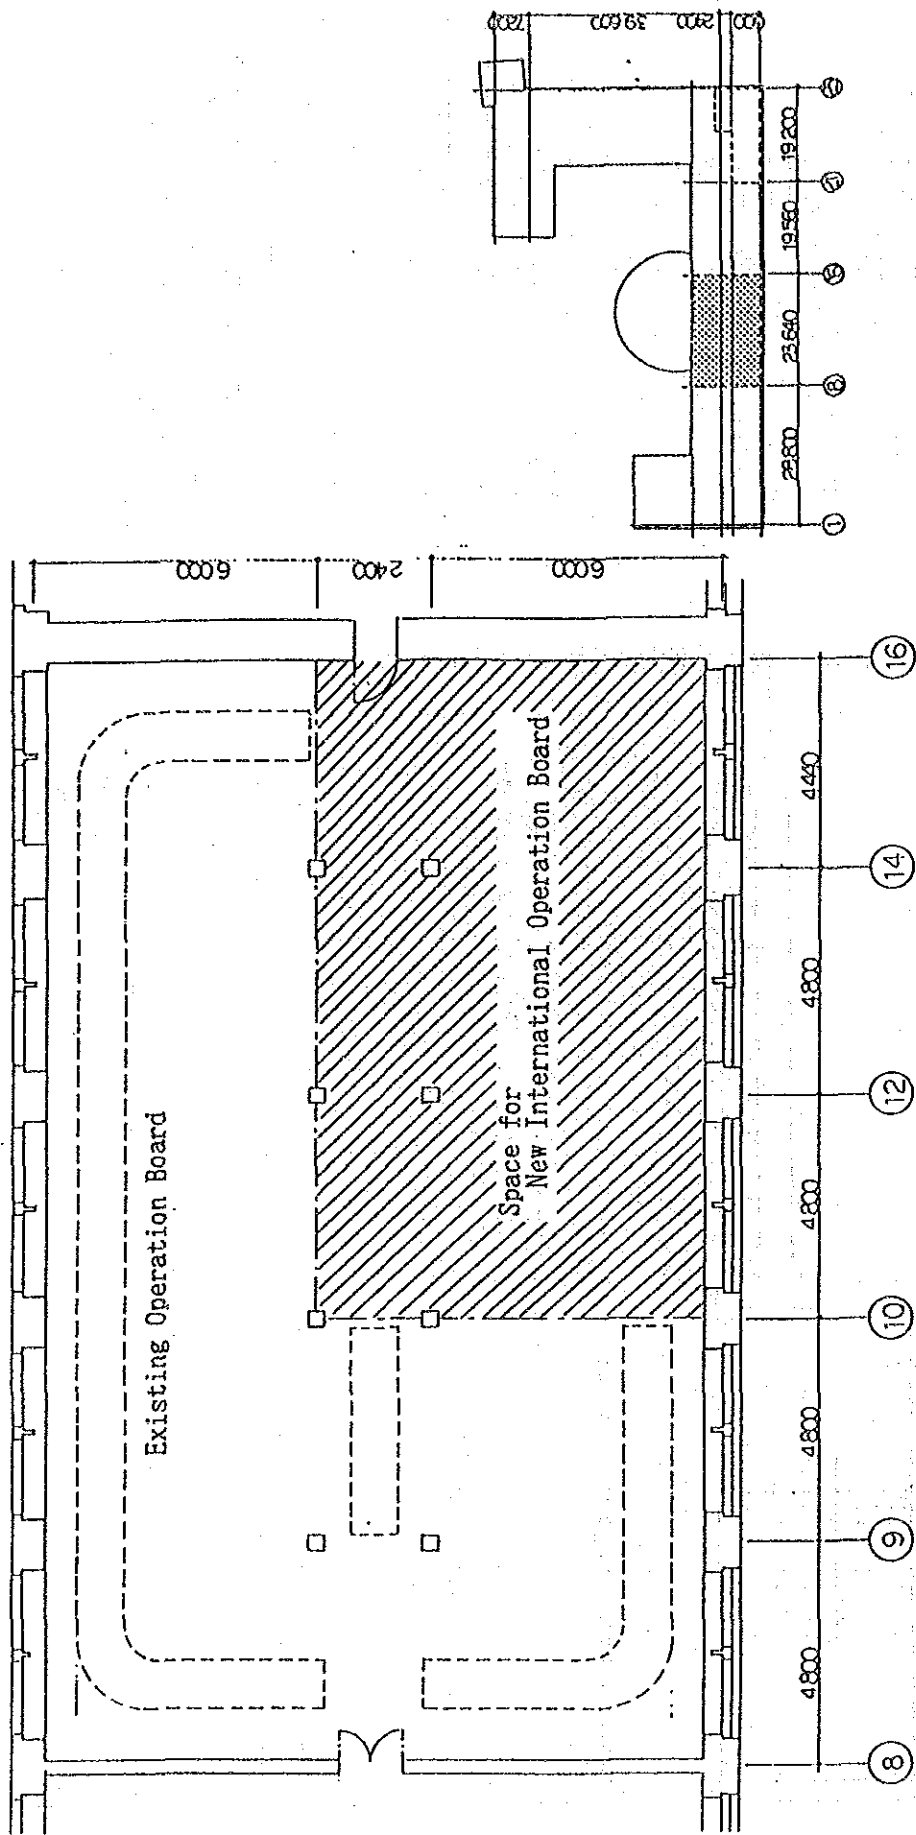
Floor Layout of Central Office Building (3F)
